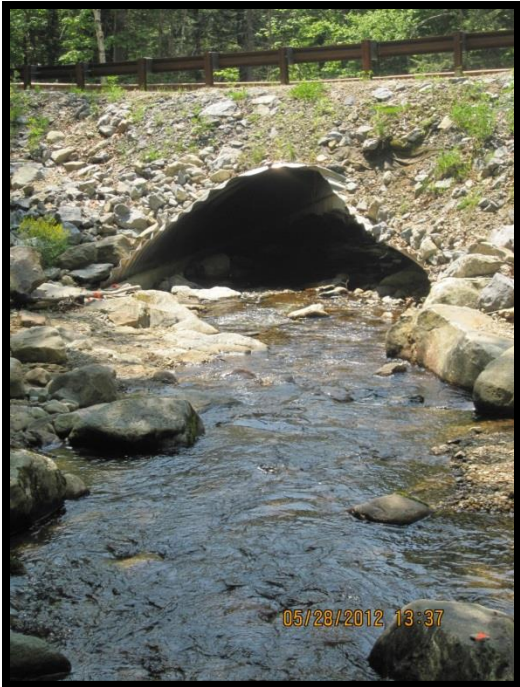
LOOKING DOWNSTREAM AT THE SPARKS BROOK STRUCTURE INLET
